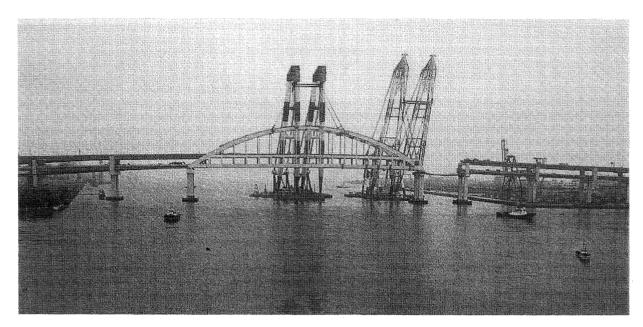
Rokko Island Bridge Shifting Superstructure back into place
